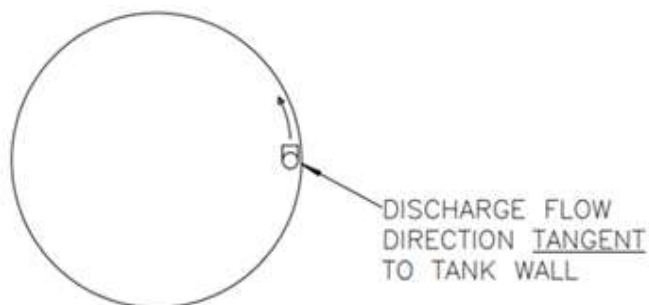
Plan View of INDALO discharge layout in a self-priming installation.
